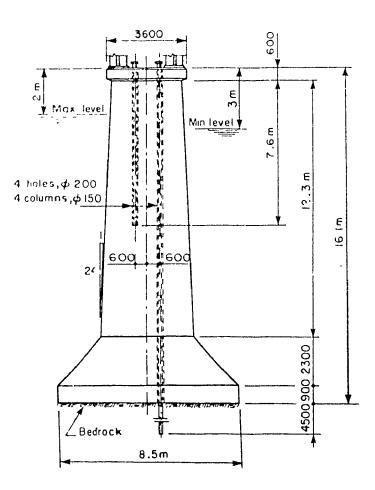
21 - PROPOSED LOAD TRANSFER COLUMNS
